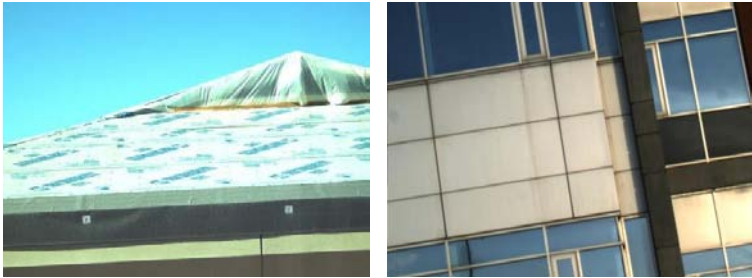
Sample video frames from a roof (left) and façade of a building (right)
